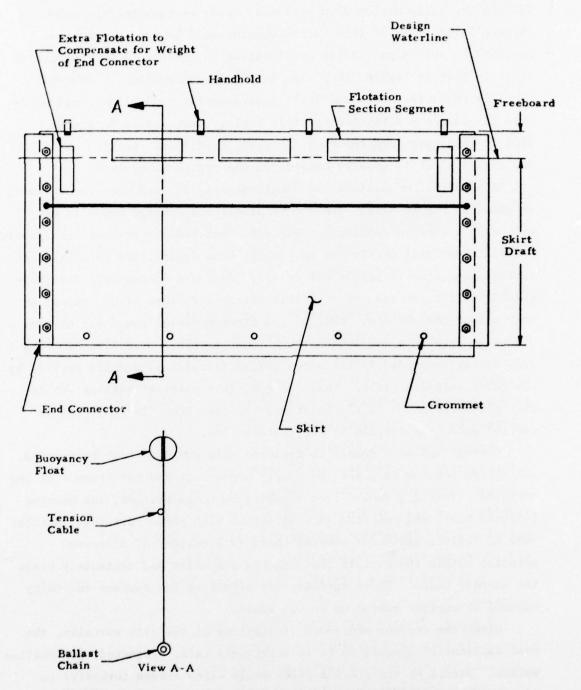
CONSTRUCTION OF A TYPICAL SILT CURTAIN SECTION.
